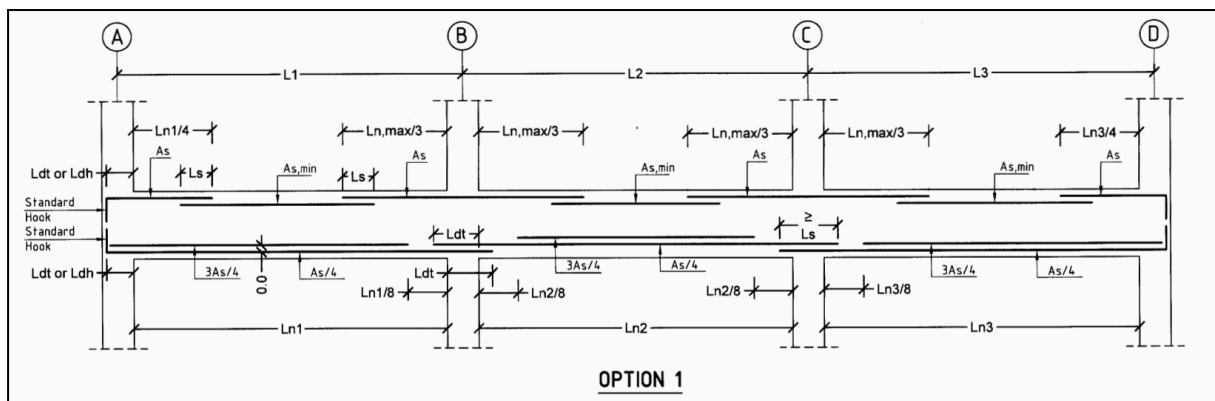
Schematic of ACI 318-19 beam detailing requirements, Option 1
